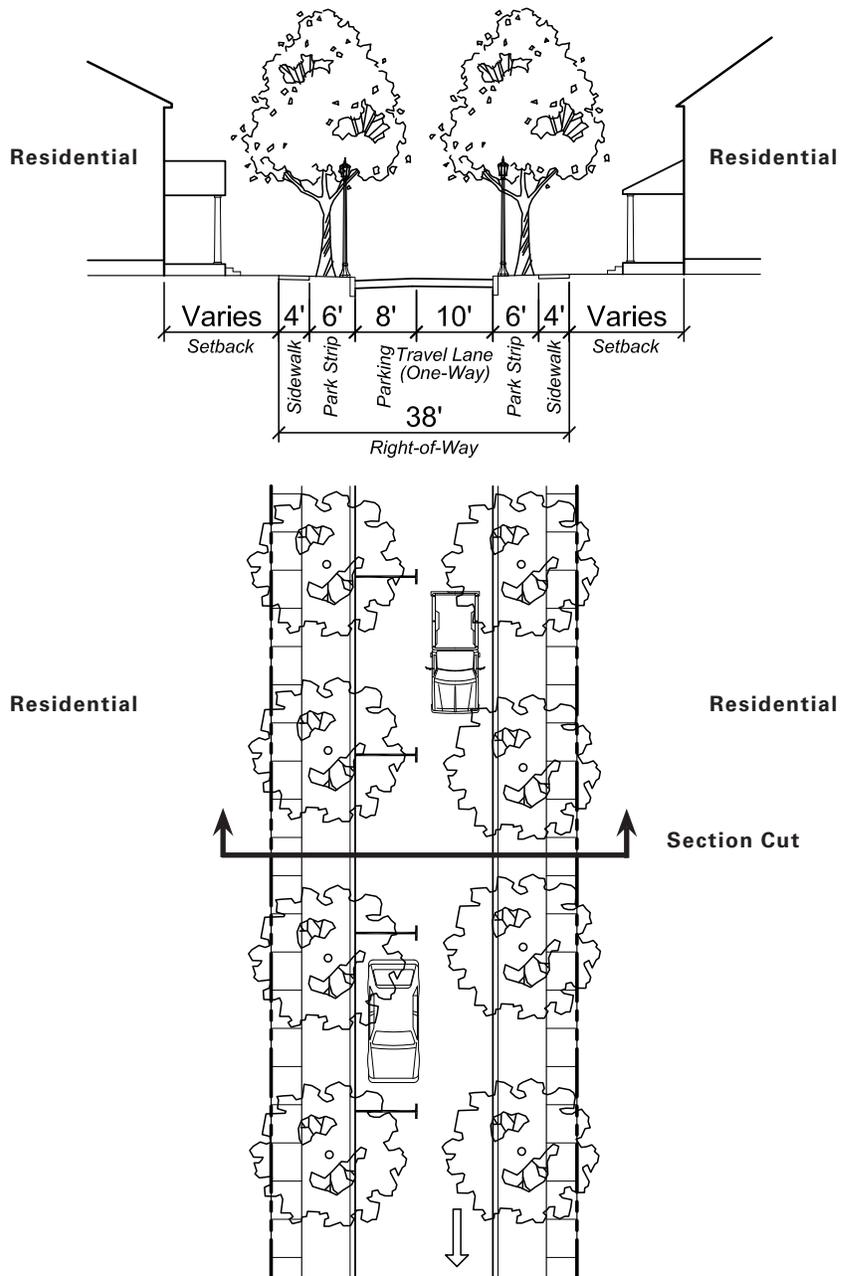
Proposed Section and Plan: One-Way Street Parking One Side
